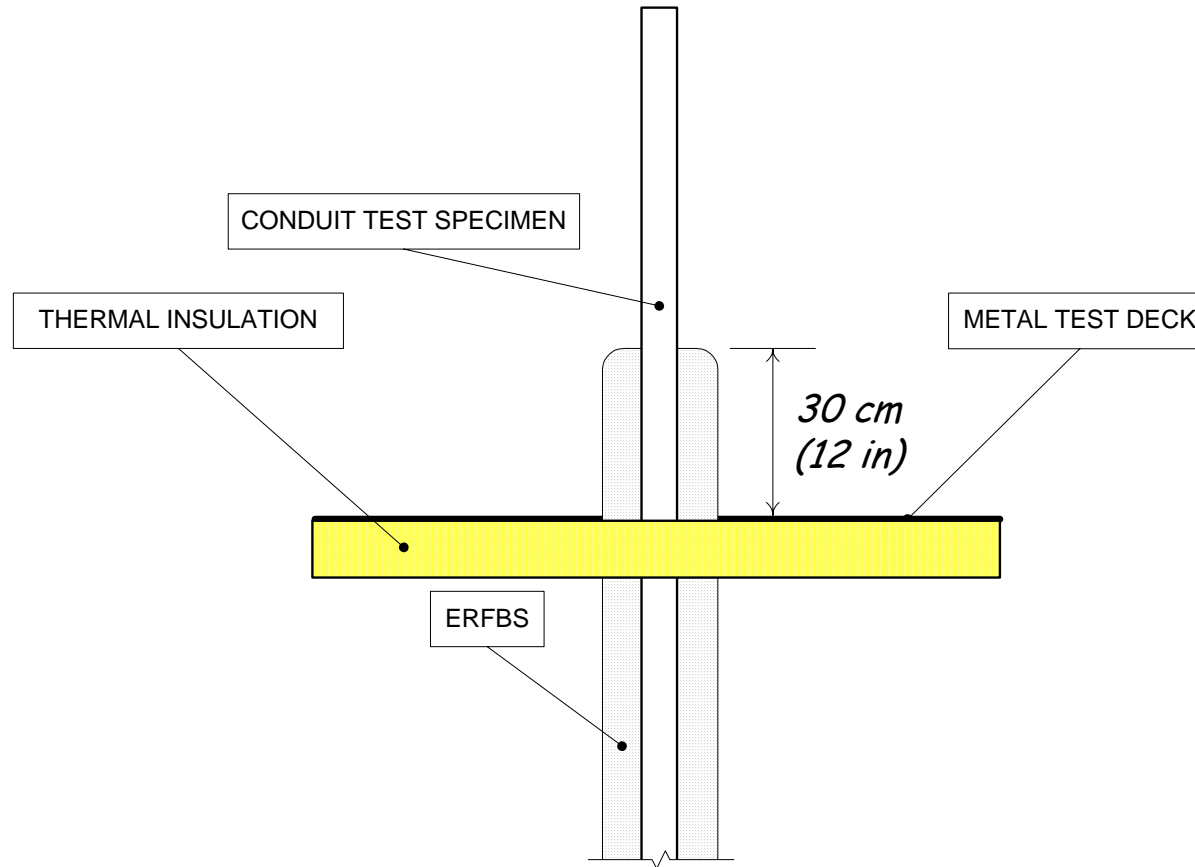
Detail of conduit test specimen direct attachment ERFBS extension through the test deck.
